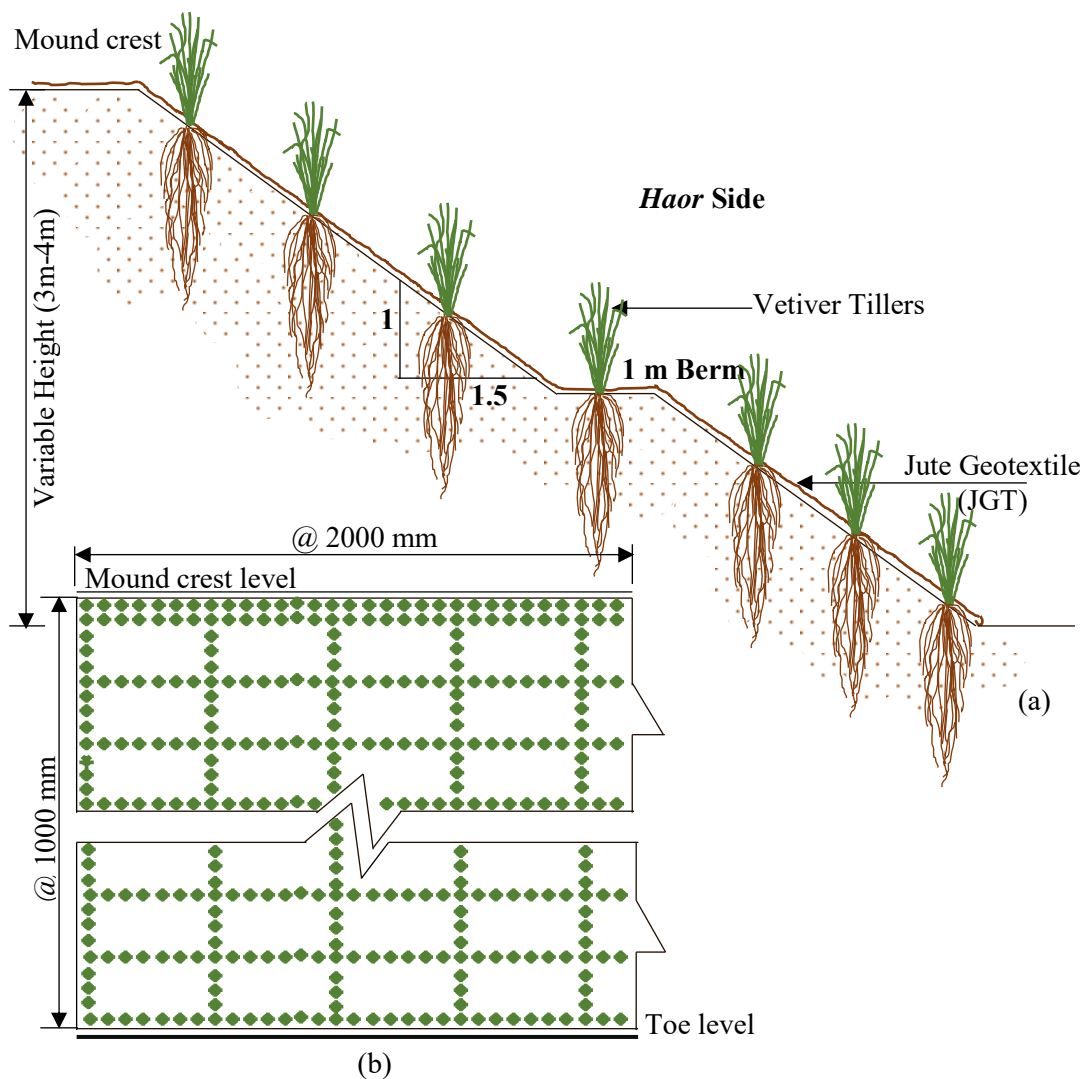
Schematic Drawing of Design Type II, (a) Cross Sectional View; and (b) Plan View (Redrawn from Islam, 2019)
